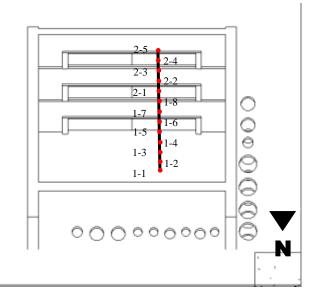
TC inside elevator shaft from 5th to 3rd floor
